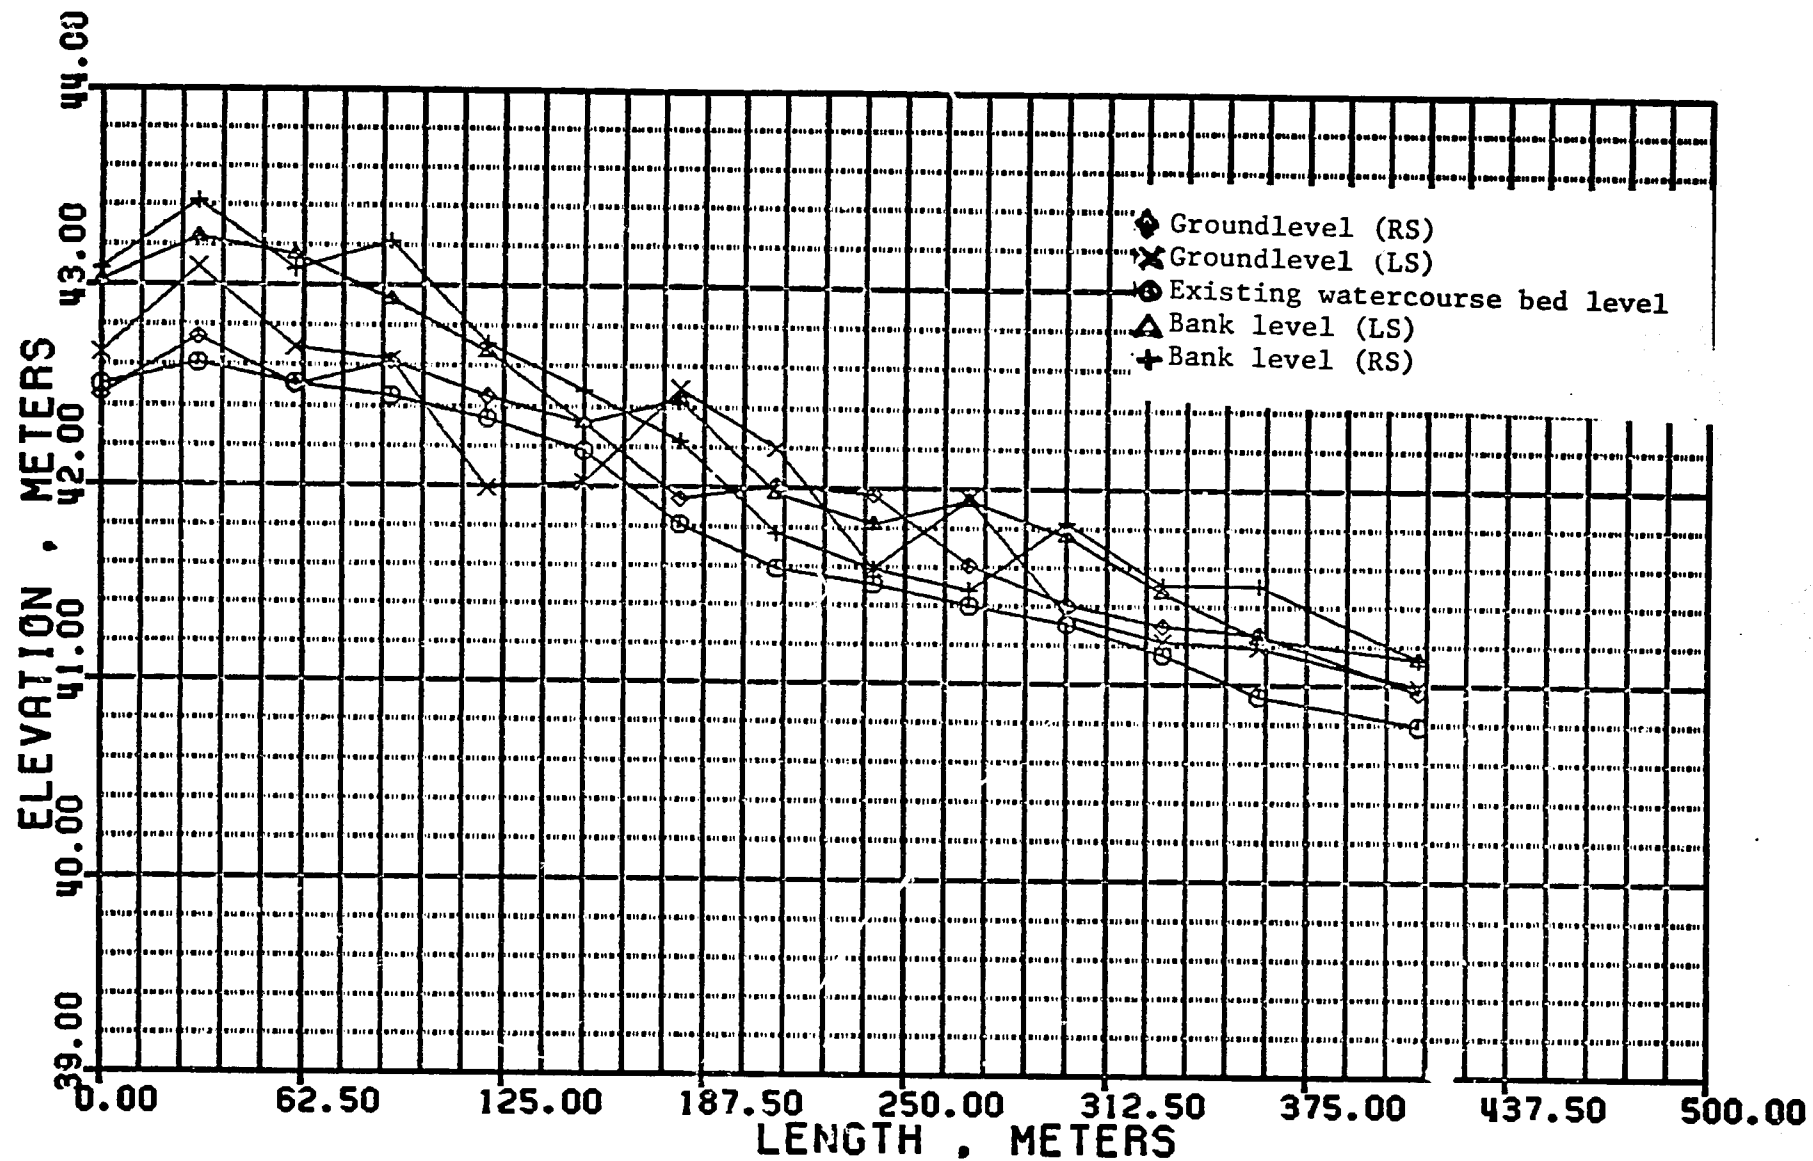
Longitudinal Section. Outlet 05/L. Subminor 10R
